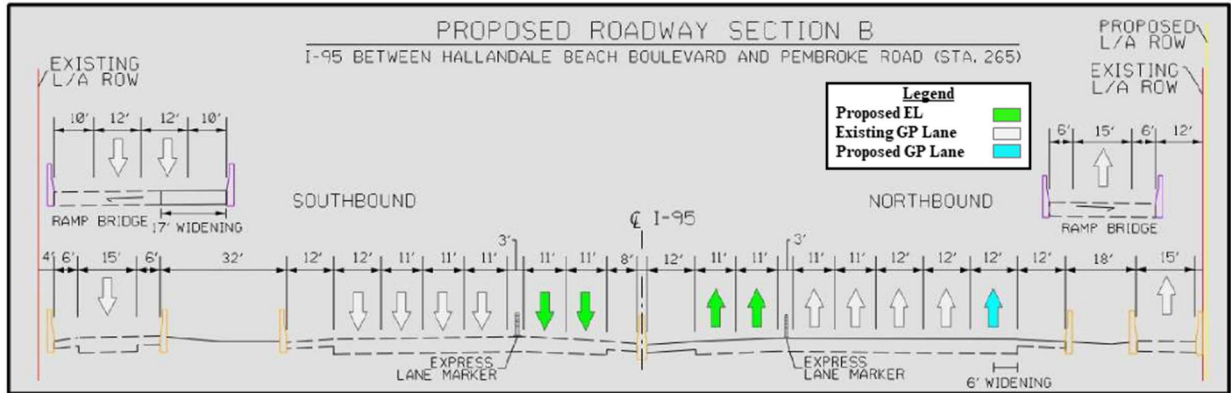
I-95 Roadway Section B – Between Hallandale Beach Blvd and Pembroke Road
